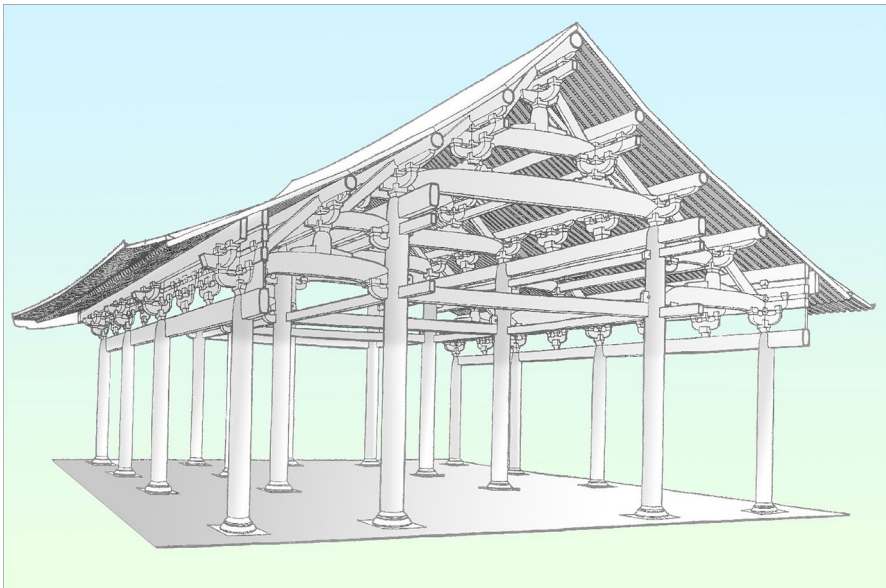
Song wooden building structure example. Image: Julian Wang, after (Liang 1983)
